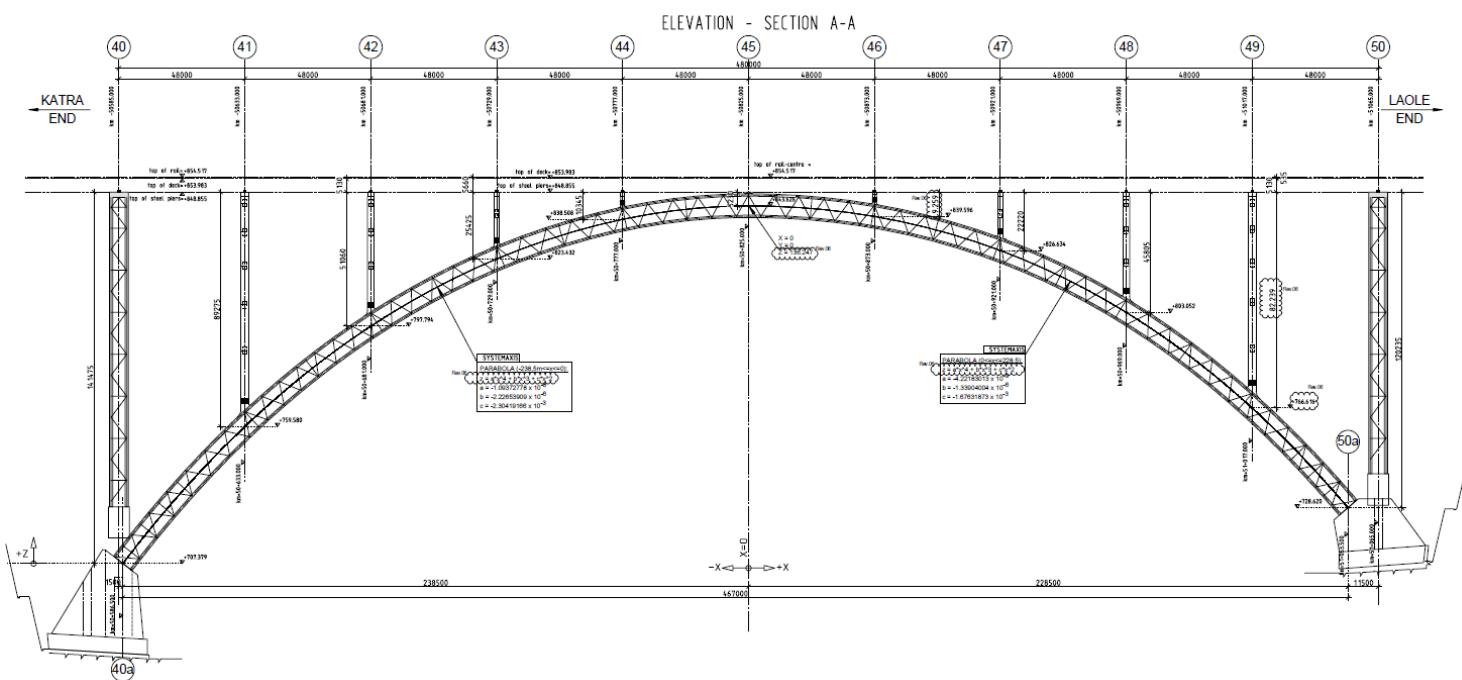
General arrangement of the arch bridge showing elements of the steel arch
